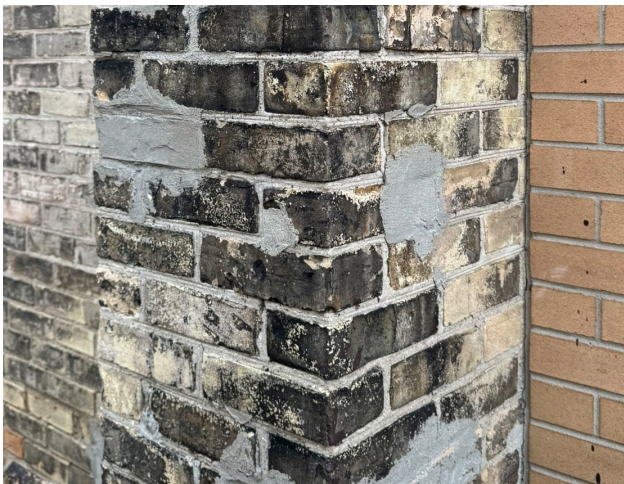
West Elevation, butters with parging, staining, and localized deterioration
